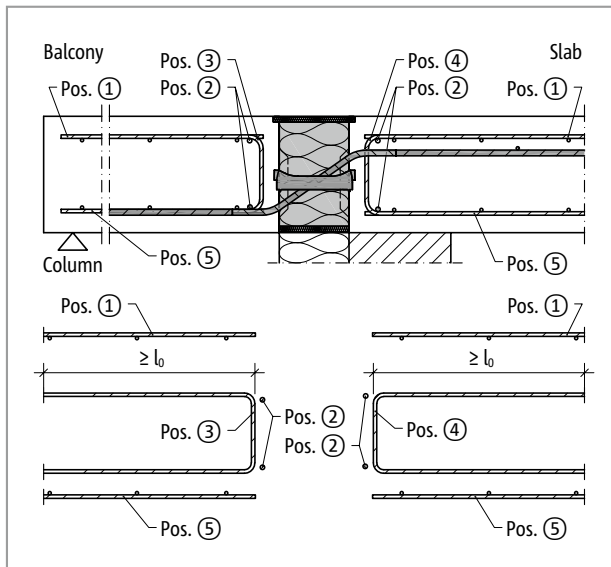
Schöck Isokorb® XT type Q-V5 to Q-V11: On-site reinforcement
